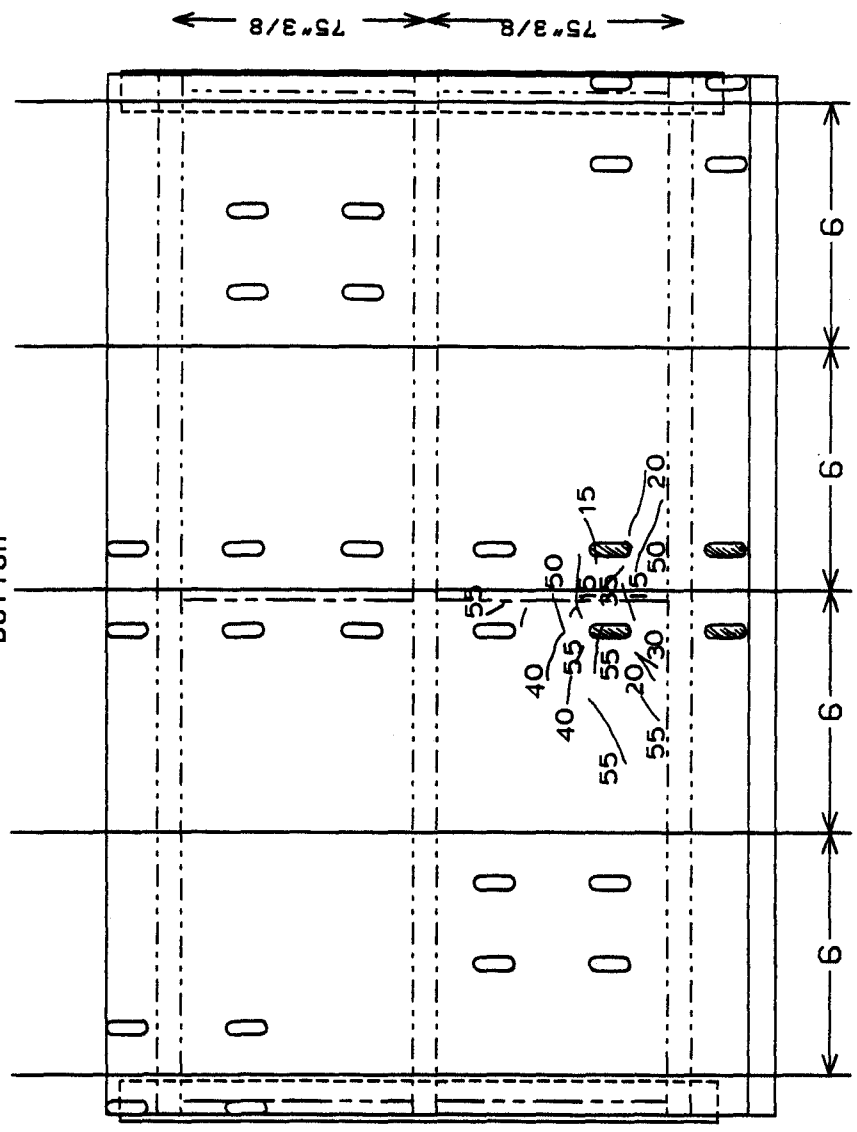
Bottom Cracking Pattern (Second Bridge - Test No. 4)
